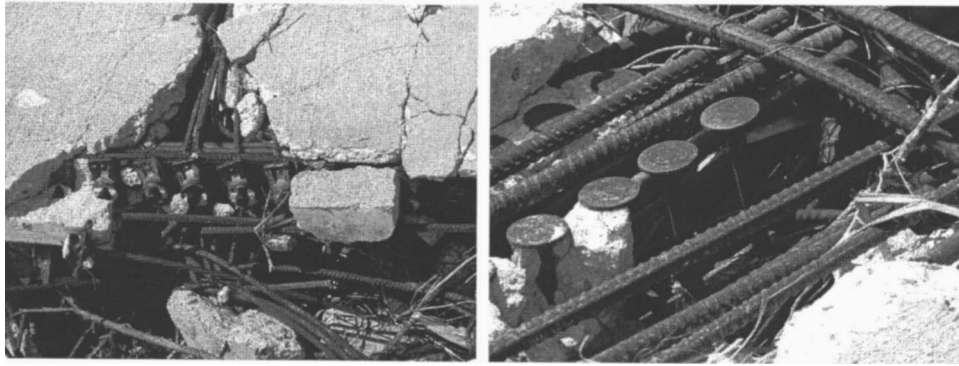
Posttensioned anchors at slab edge and headed stud shear reinforcement at slab-column connection
